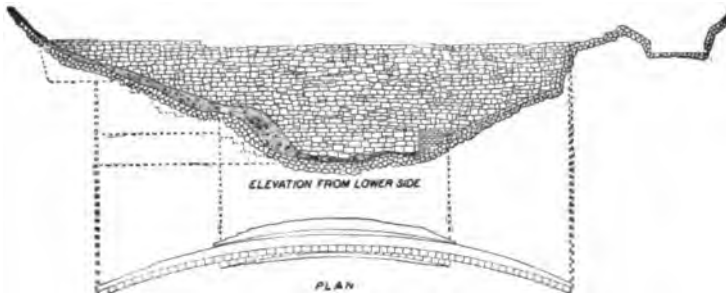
PLAN AND ELEVATION OF BEAR VALLEY DAM.
